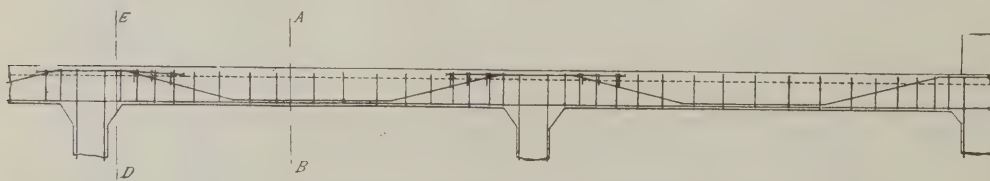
LONGITUDINAL SECTION OF HENNEBIQUE BEAM.
